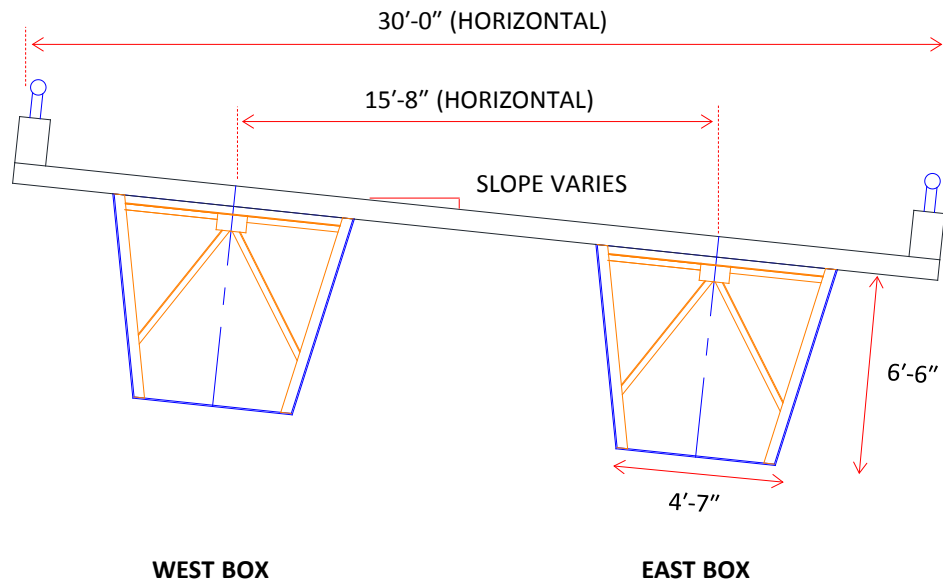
Dimensioned cross-section view of the US-290 Bridge.
